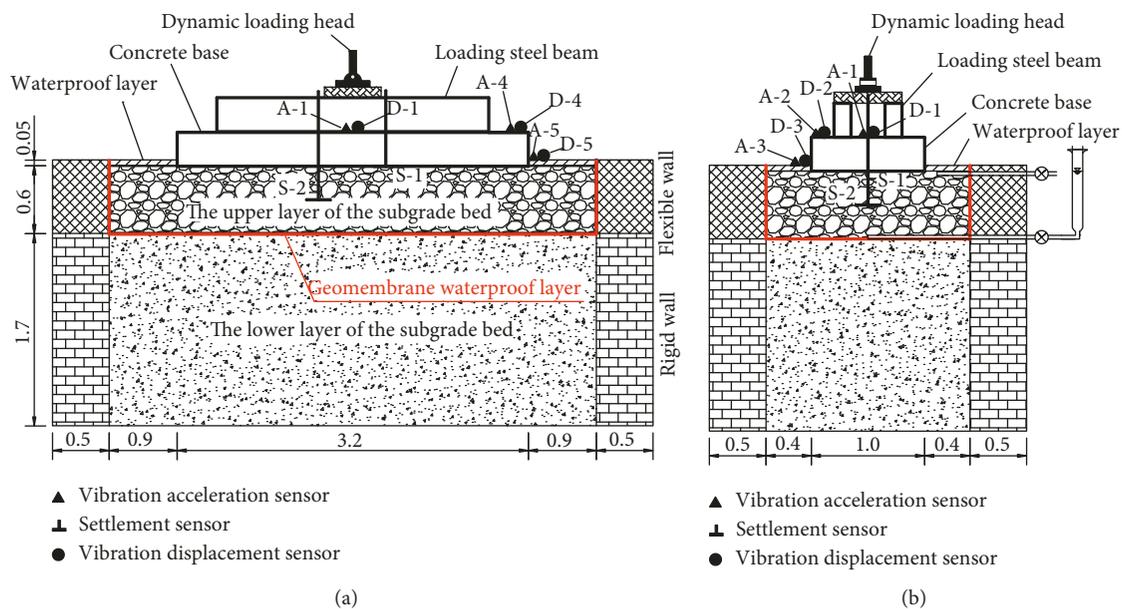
The full-scale model: (a) cross section and (b) longitudinal section profiles (units in meter).
